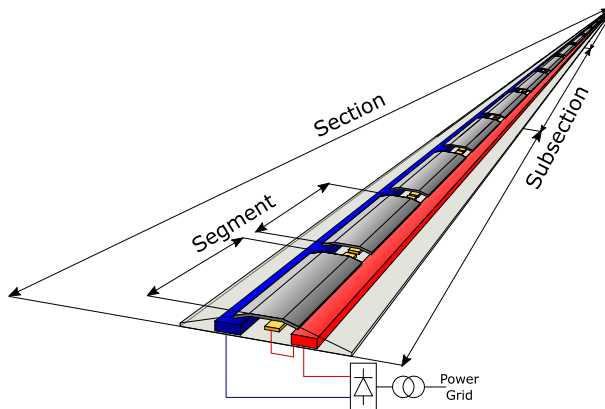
Shows how the ASSE is divided into sections, subsections and segments.
